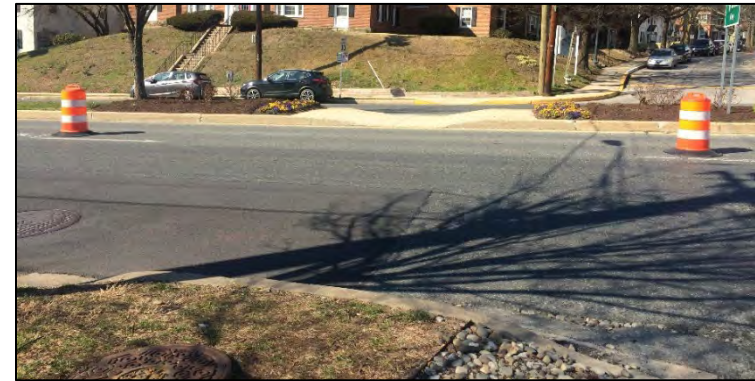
This crossing at Draper Lane and Colesville Road is missing a curb cut on the eastern side (as well as a crosswalk) and is the only crossing of Colesville Road between East-West Highway and I 6th Street.
